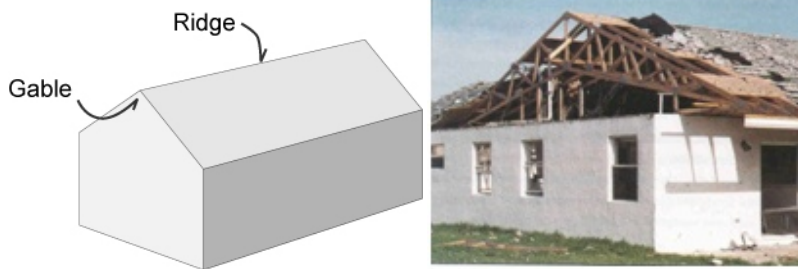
Illustration of a Gable Roof and Hurricane Damage
